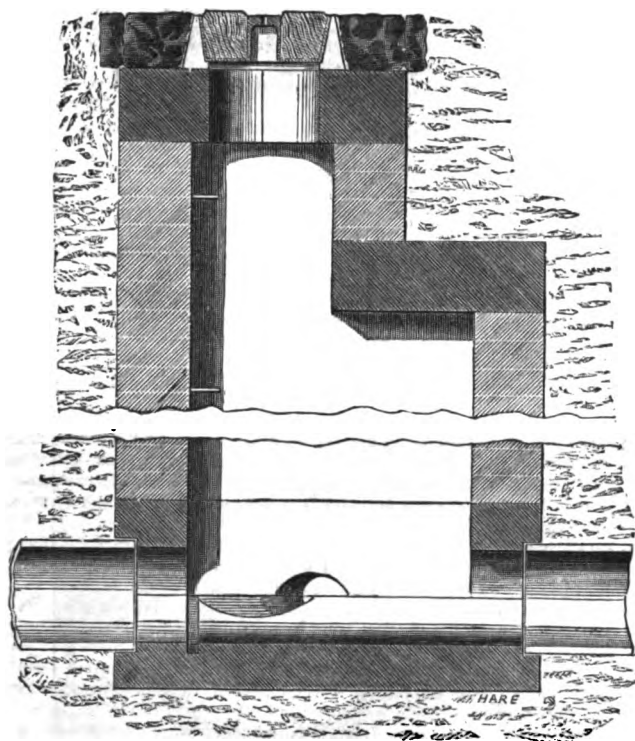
Manhole, with Junctions in Pipe Sewer. Section on the line A A, of Fig. 2.
